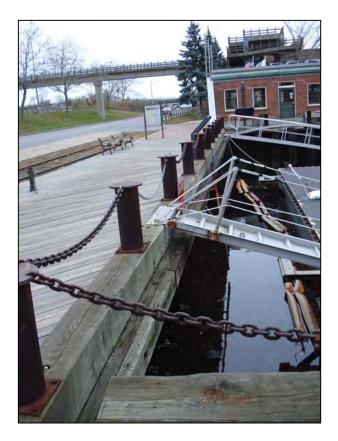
Overview of the timber curb with steel bollards along the timber deck.
